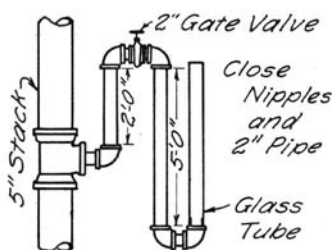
PIEZOMETER CONNECTIONS TO 5-IN. STACK IN RIDGLEY FARMERS STATE BANK BUILDING
